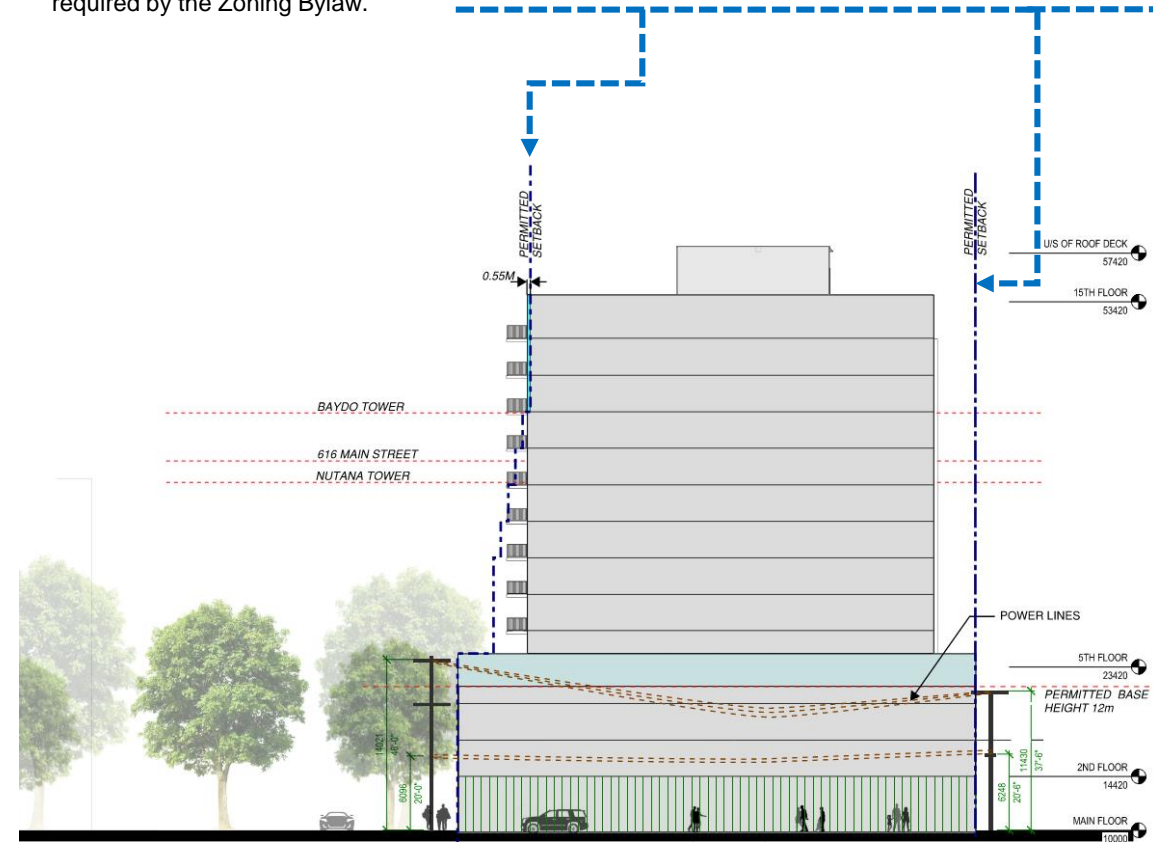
Proposed Built Volume, Dufferin Ave Elevation
